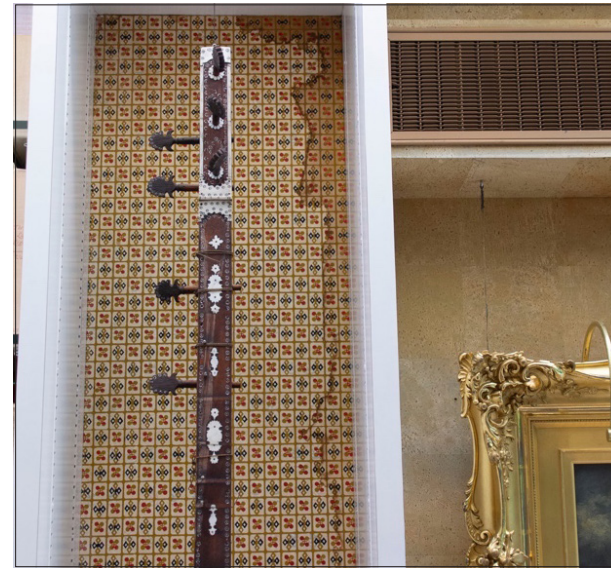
Water damage to wallpaper in the Storage Wall. Date: June 2021. Photo credit: Building Conservation Associates
